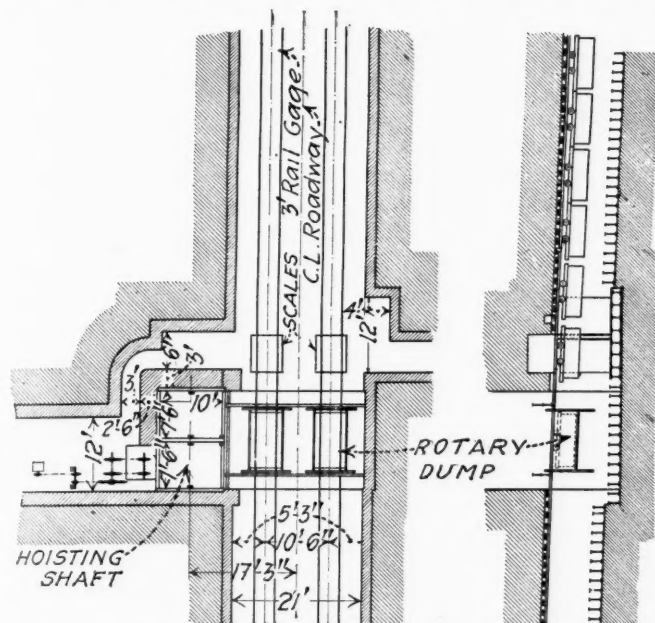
PLAN AND ELEVATION, SHAFT BOTTOM, PHALEN SEAM
